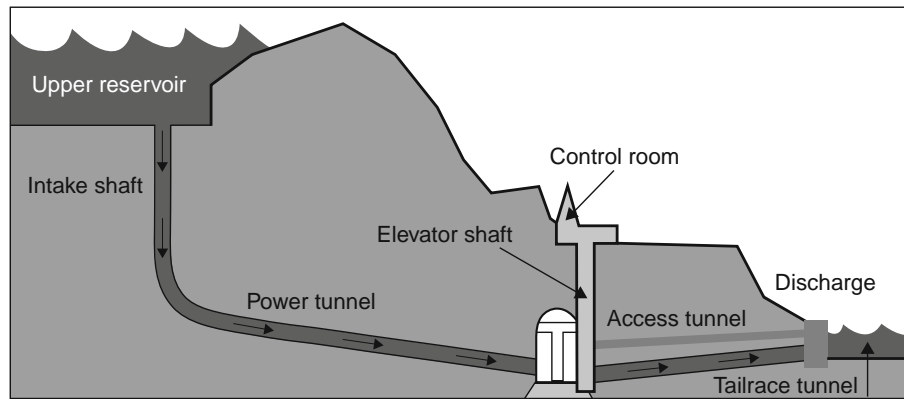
Cross section of a pumped storage hydropower plant.
